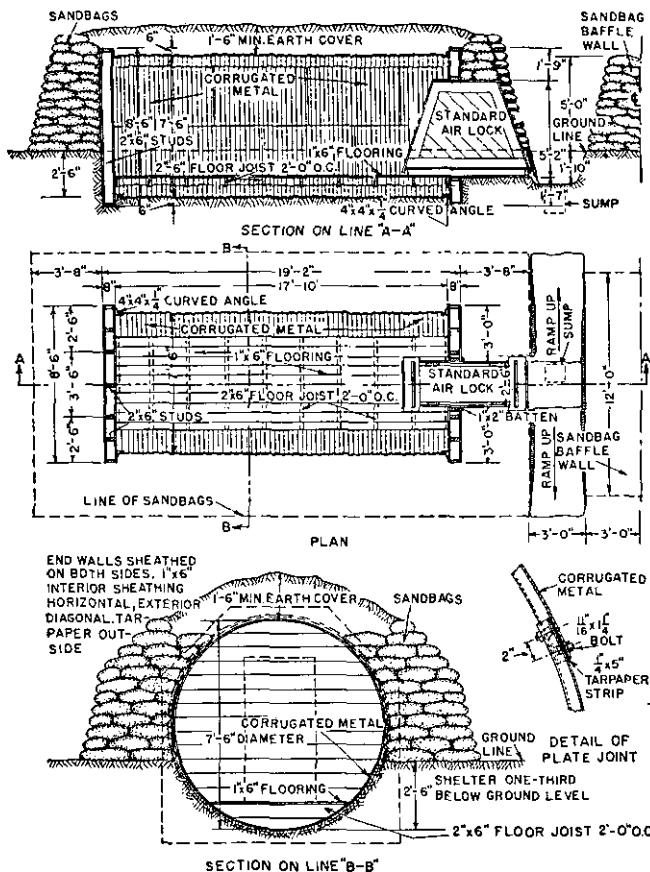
Surface shelter constructed of a circular section of corrugated metal and utilizing sandbag blast wall.
